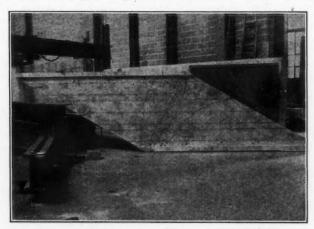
CRACKS IN THE TOP SUBFACE OF A 60° SKEW SLAB
